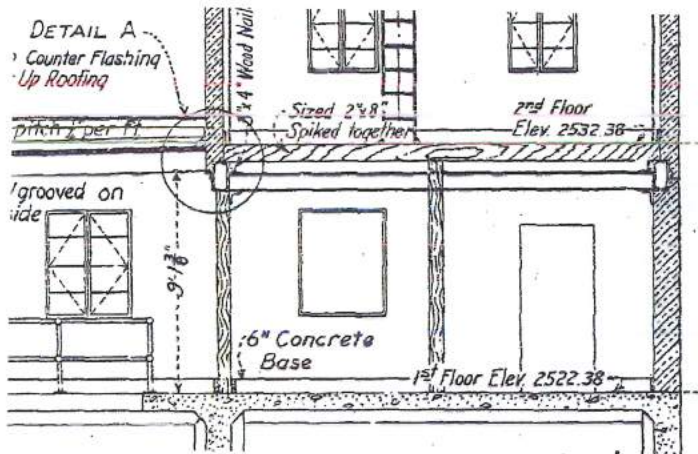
Section Through Storage Floor Showing 2x8 Second Floor Joists
